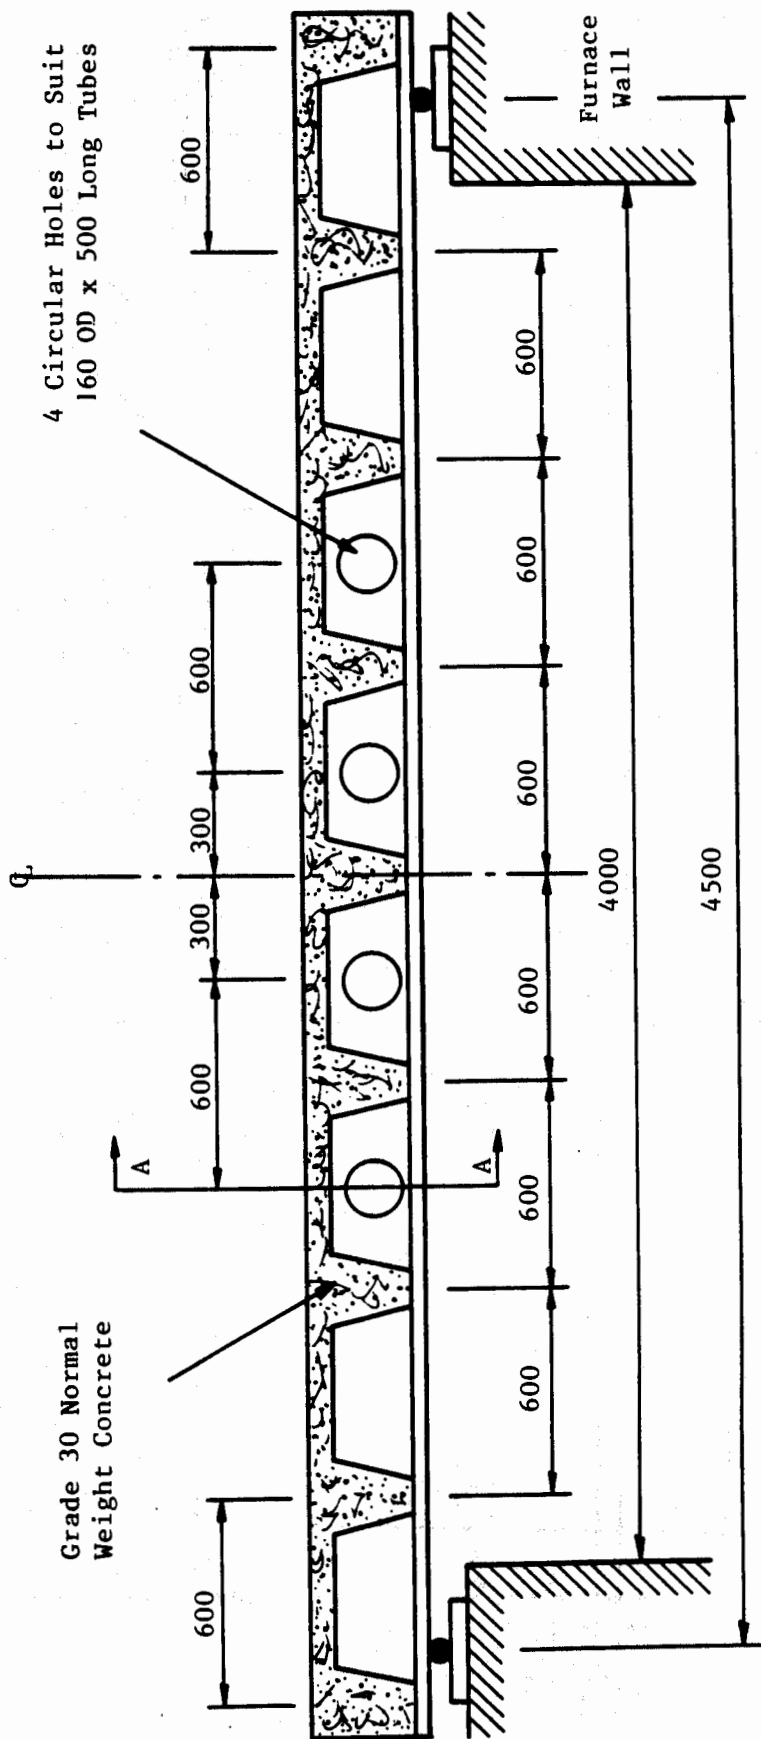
SCHEMATIC ARRANGEMENT OF COMPONENTS - LONGITUDINAL ARRANGEMENT (R4/50)
